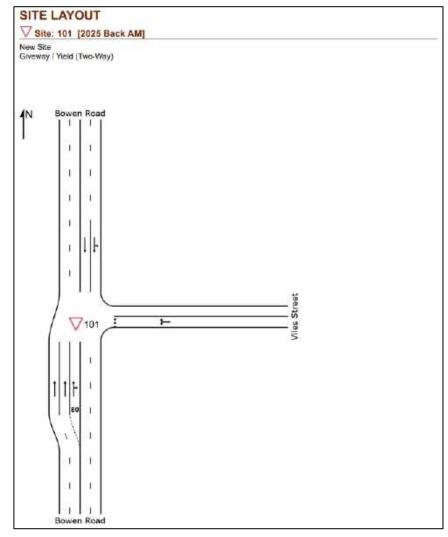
Existing Bowen Road/Viles Street Intersection Layout
